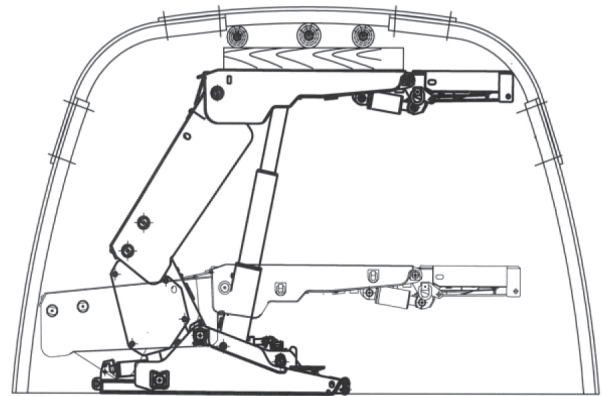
ŁPrP frame variant Ł with an installed powered support unit (unit before and after spragging)
